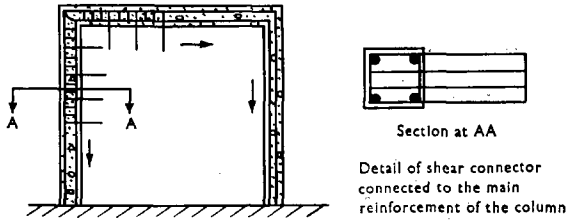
Provision of shear connectors in reinforced concrete infilled frame
